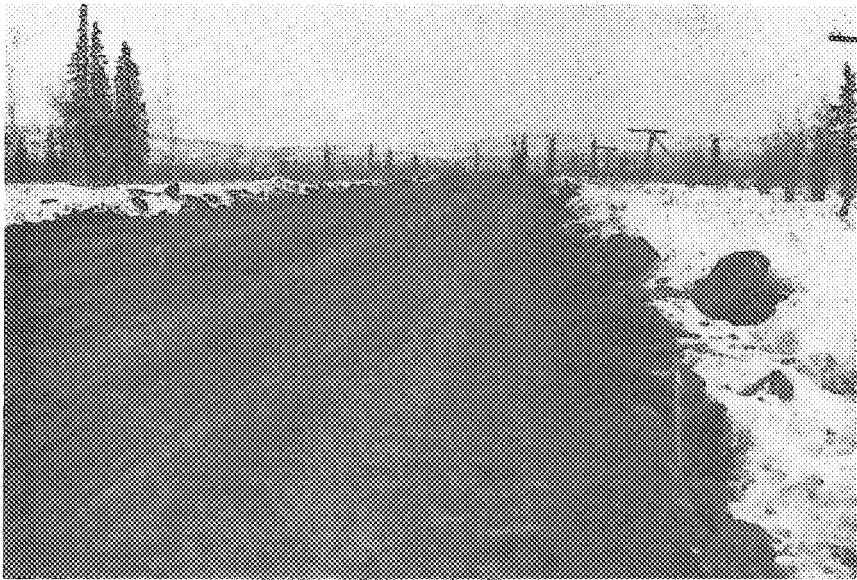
Winter test site--Prepared bedding layer upon which insulation will be placed.
